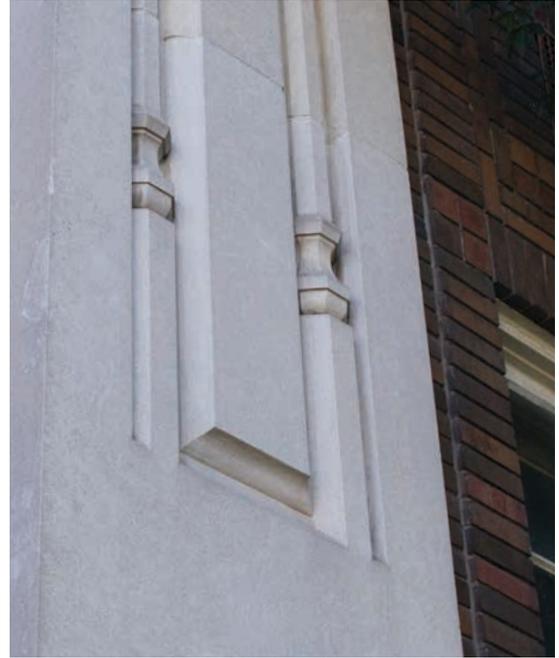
\_ 1922 Limestone Pilaster Detail
